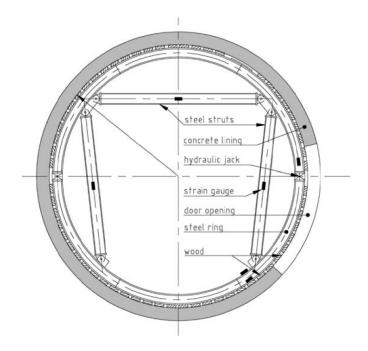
Pre-stressed steel ring inside tunnel (from Mortier 2004)
